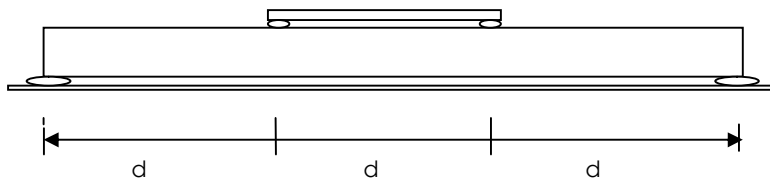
Principle of the Third Point Loading method of flexural testing of concrete beams
